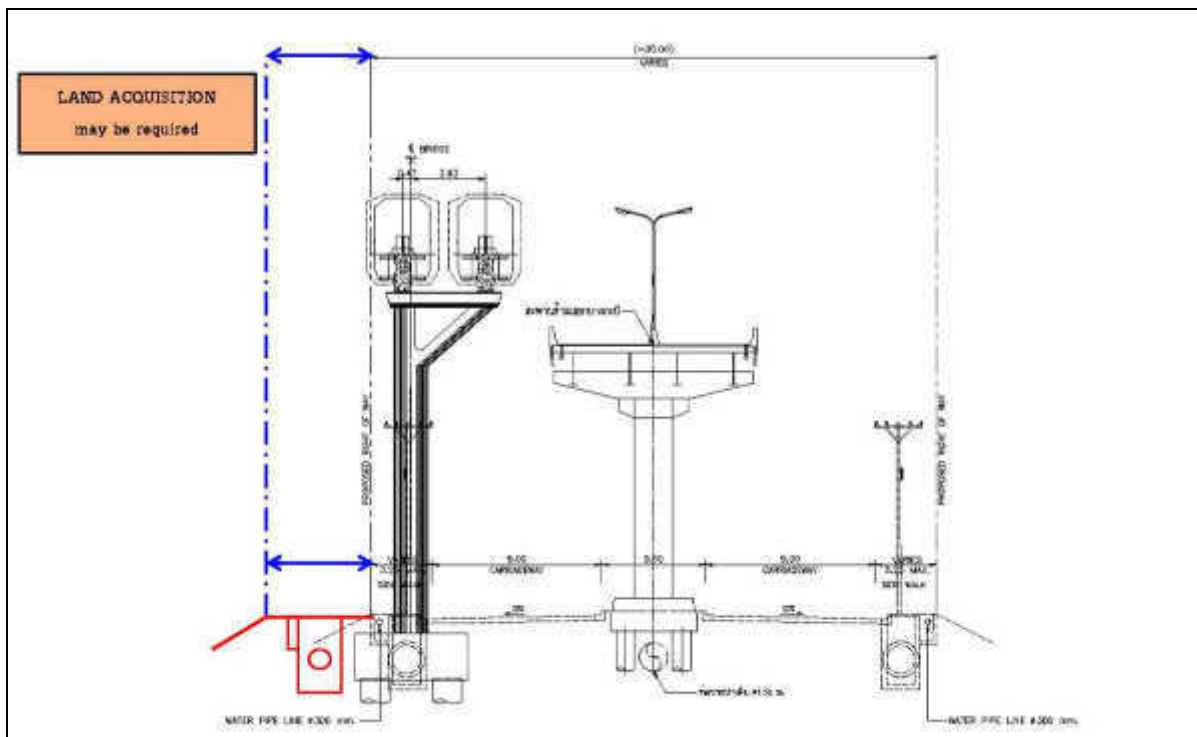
2 Cross section of project at Bang Kapi Junction, 2<sup>nd</sup> Alternative
